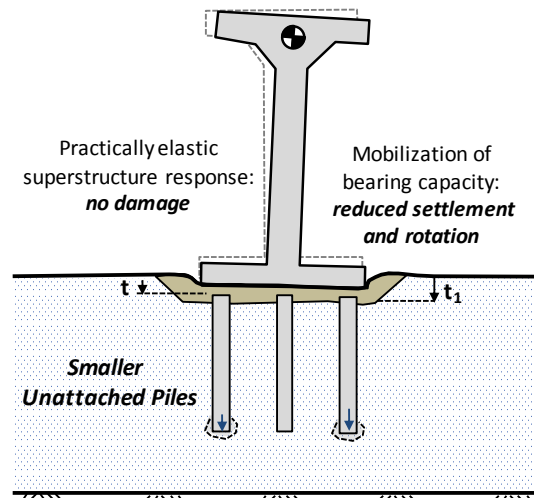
Bridge Pier on unconnected piles with interposed stiff soil layer
